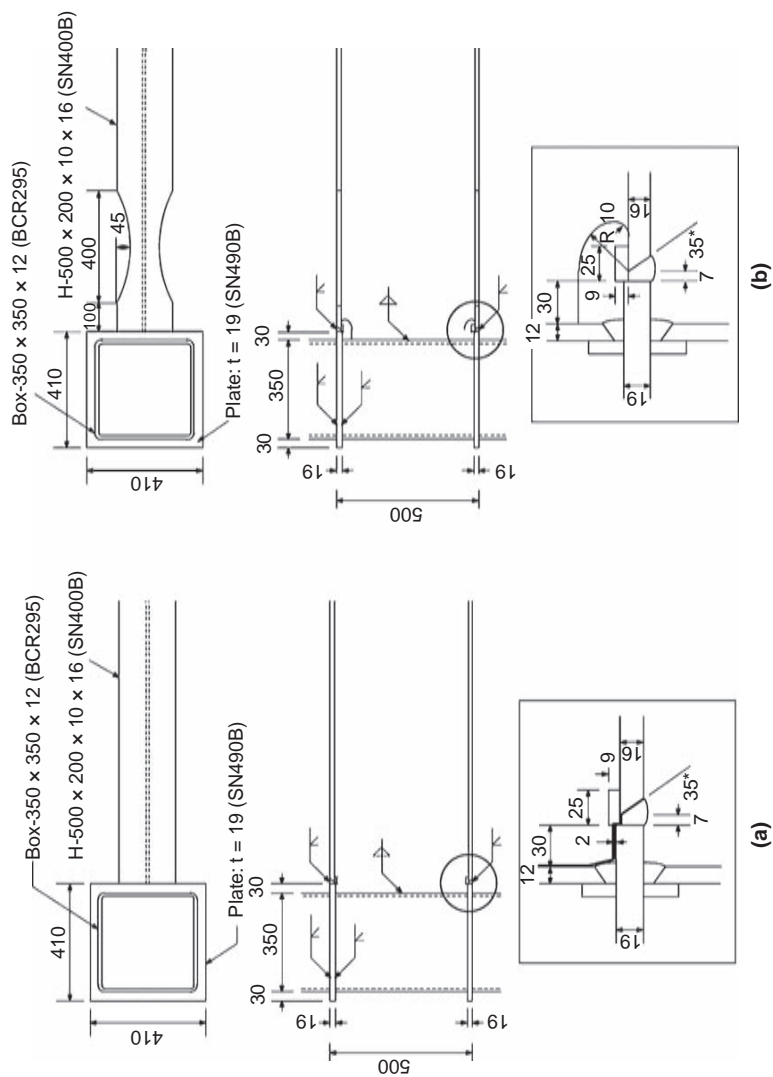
Moment connection specimens considered for Japanese practice: (a) no-hole detail; (b) RBS detail. (Courtesy of M. Nakashima, Disaster Prevention Research Institute, Kyoto University, Japan.)
